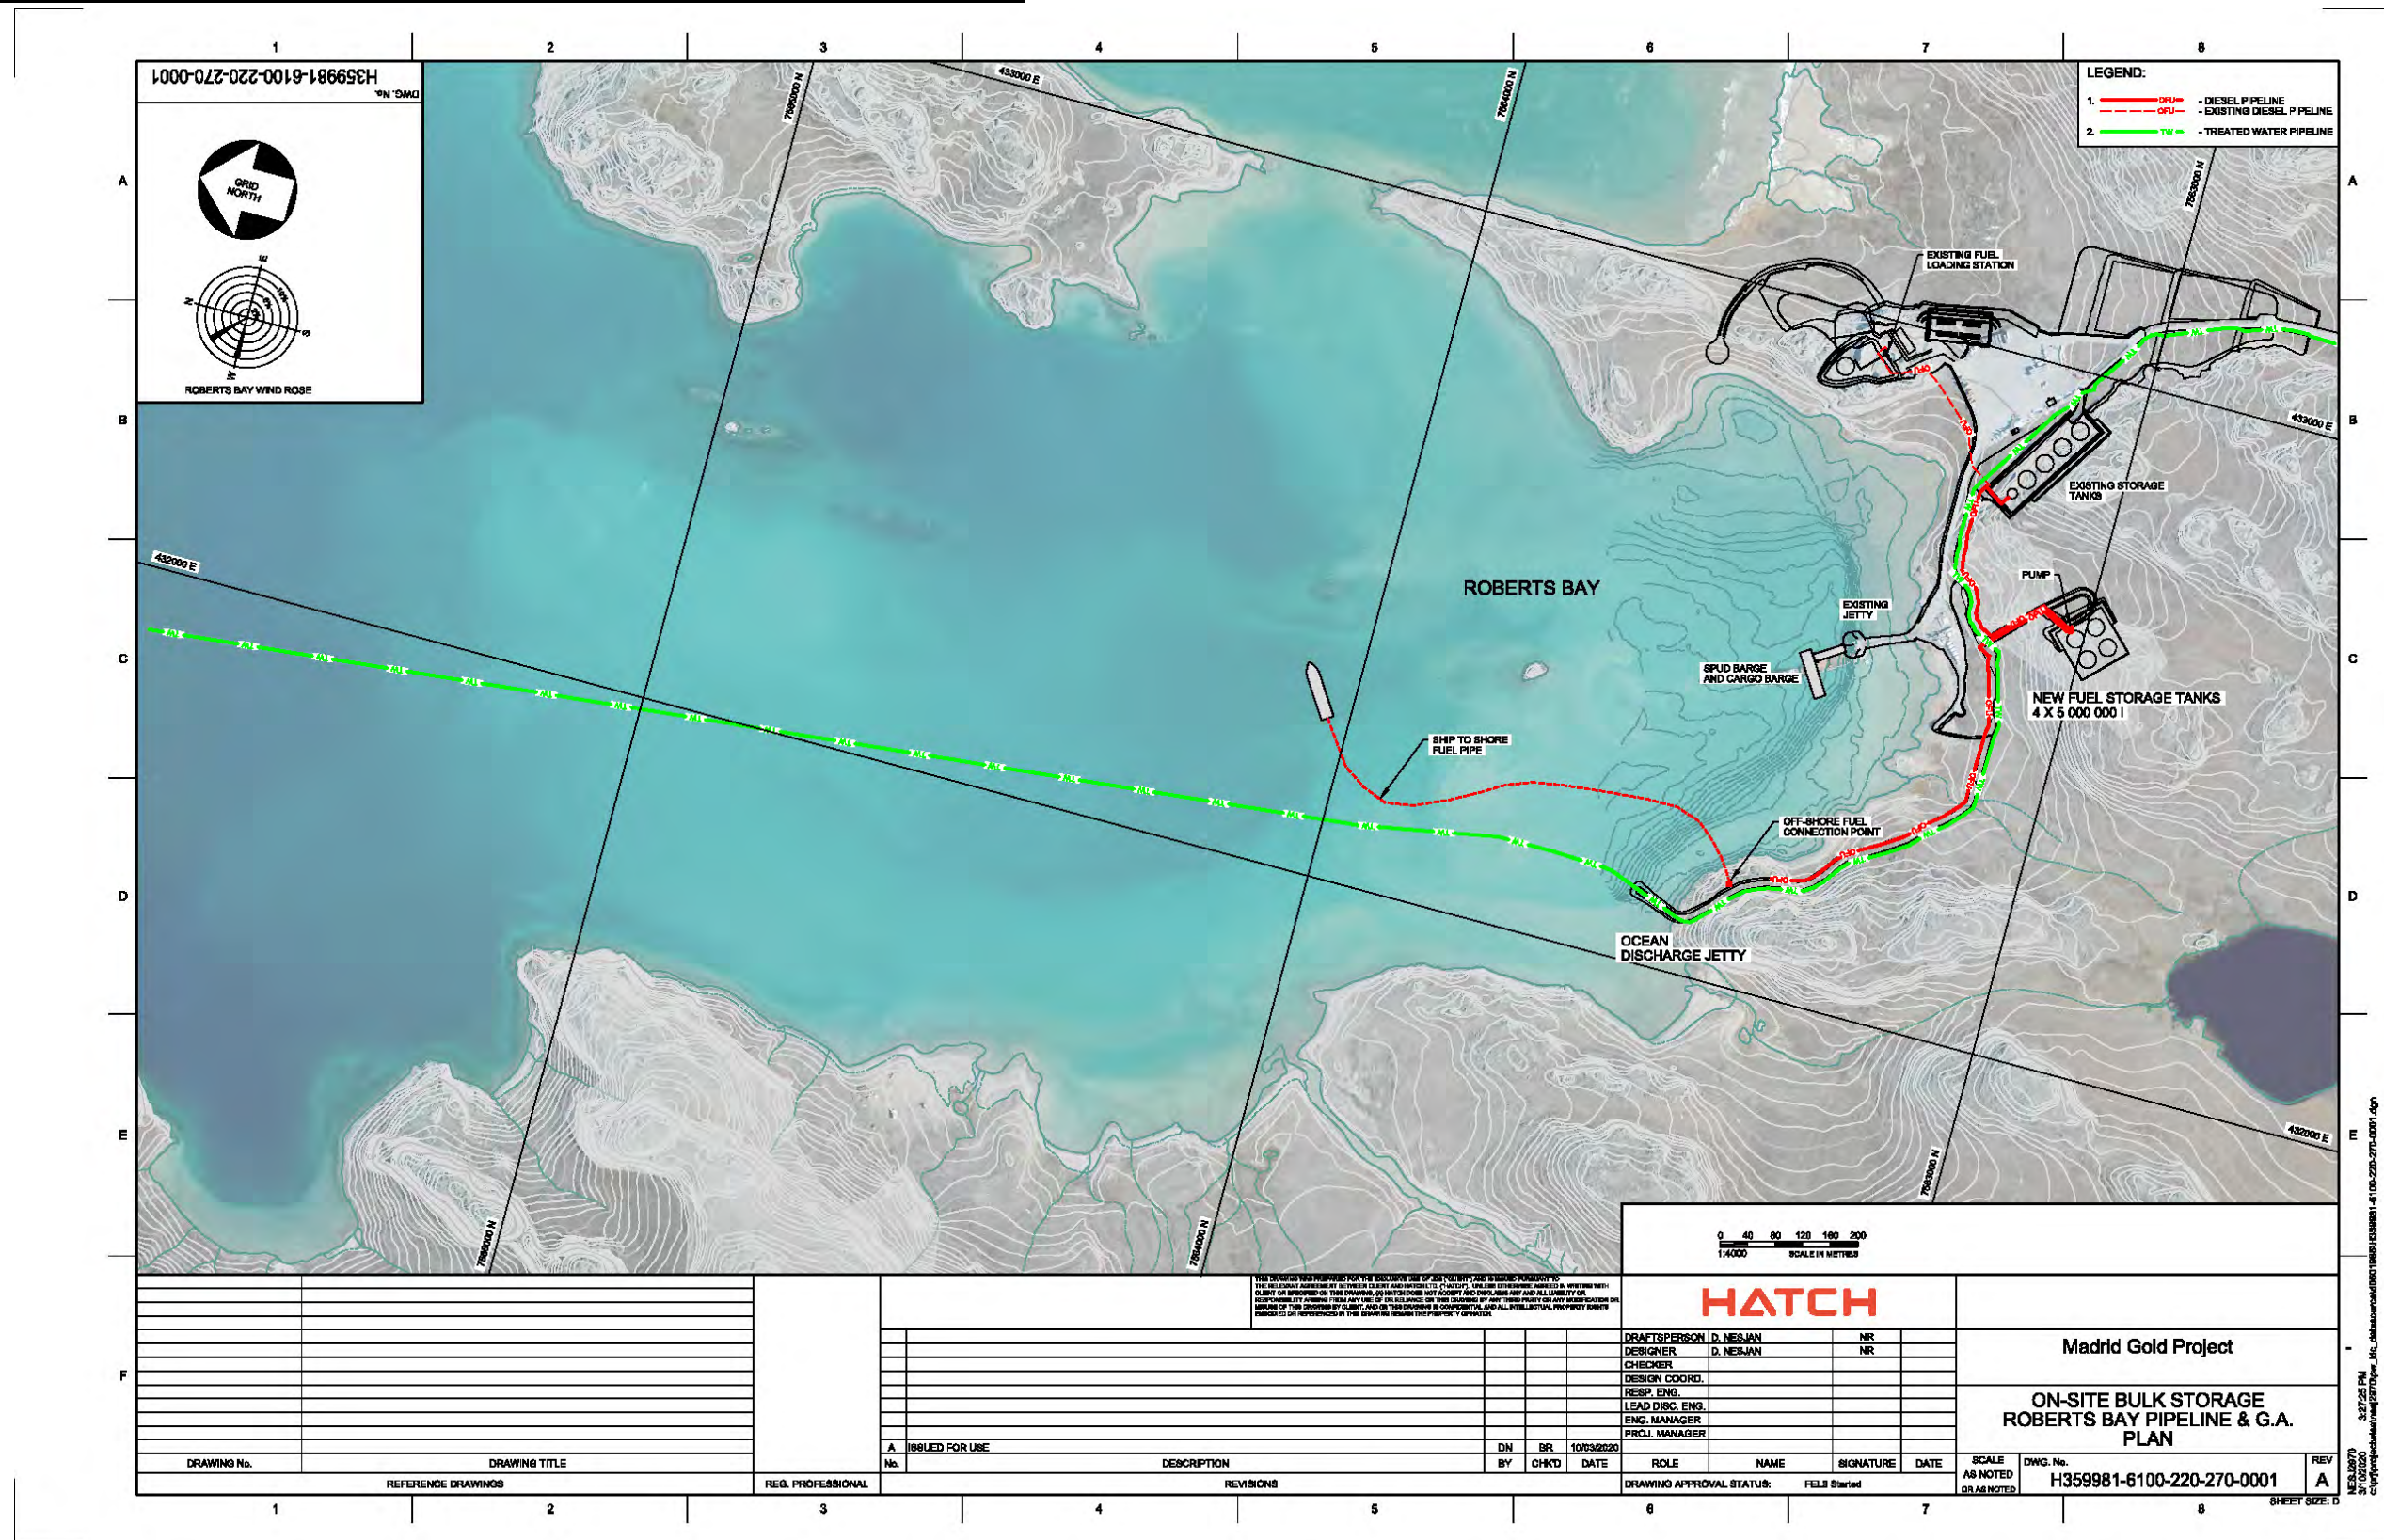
On-Site Bulk Storage Roberts Bay Pipeline & G.A. Plan
